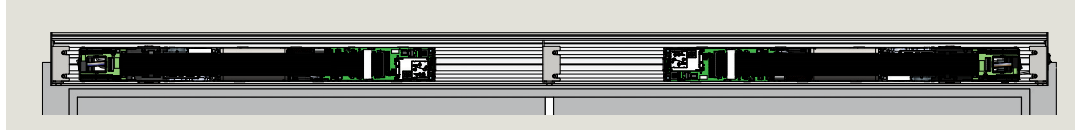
115 Vac power cable installed on operator with 115 Vac customer connection
